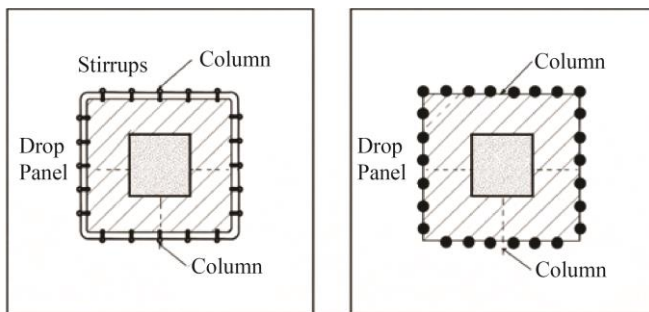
Reinforcement configurations, (a) Stirrups, and (b) Stud rails.
